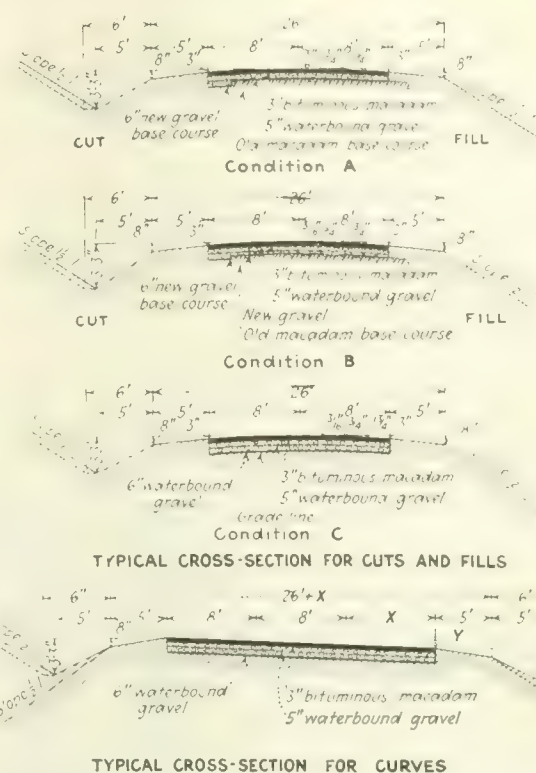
CROSS-SECTIONS FOR DIFFERENT CONDITIONS OF OLD ROAD
